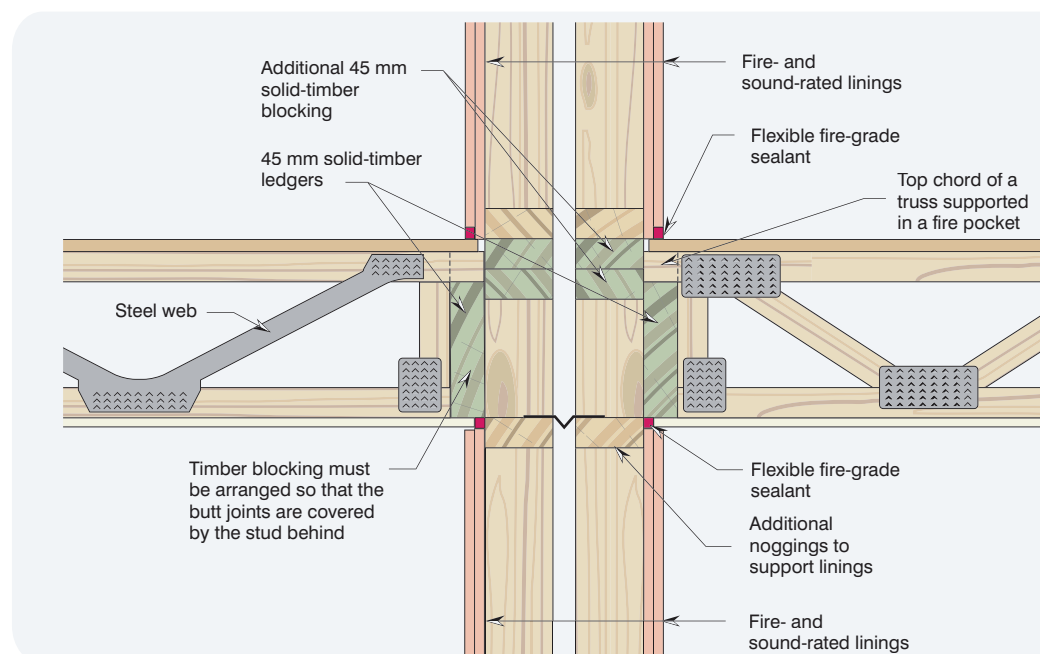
Alternative floor-truss top chord support – FRL 60 minutes – elevation view.
